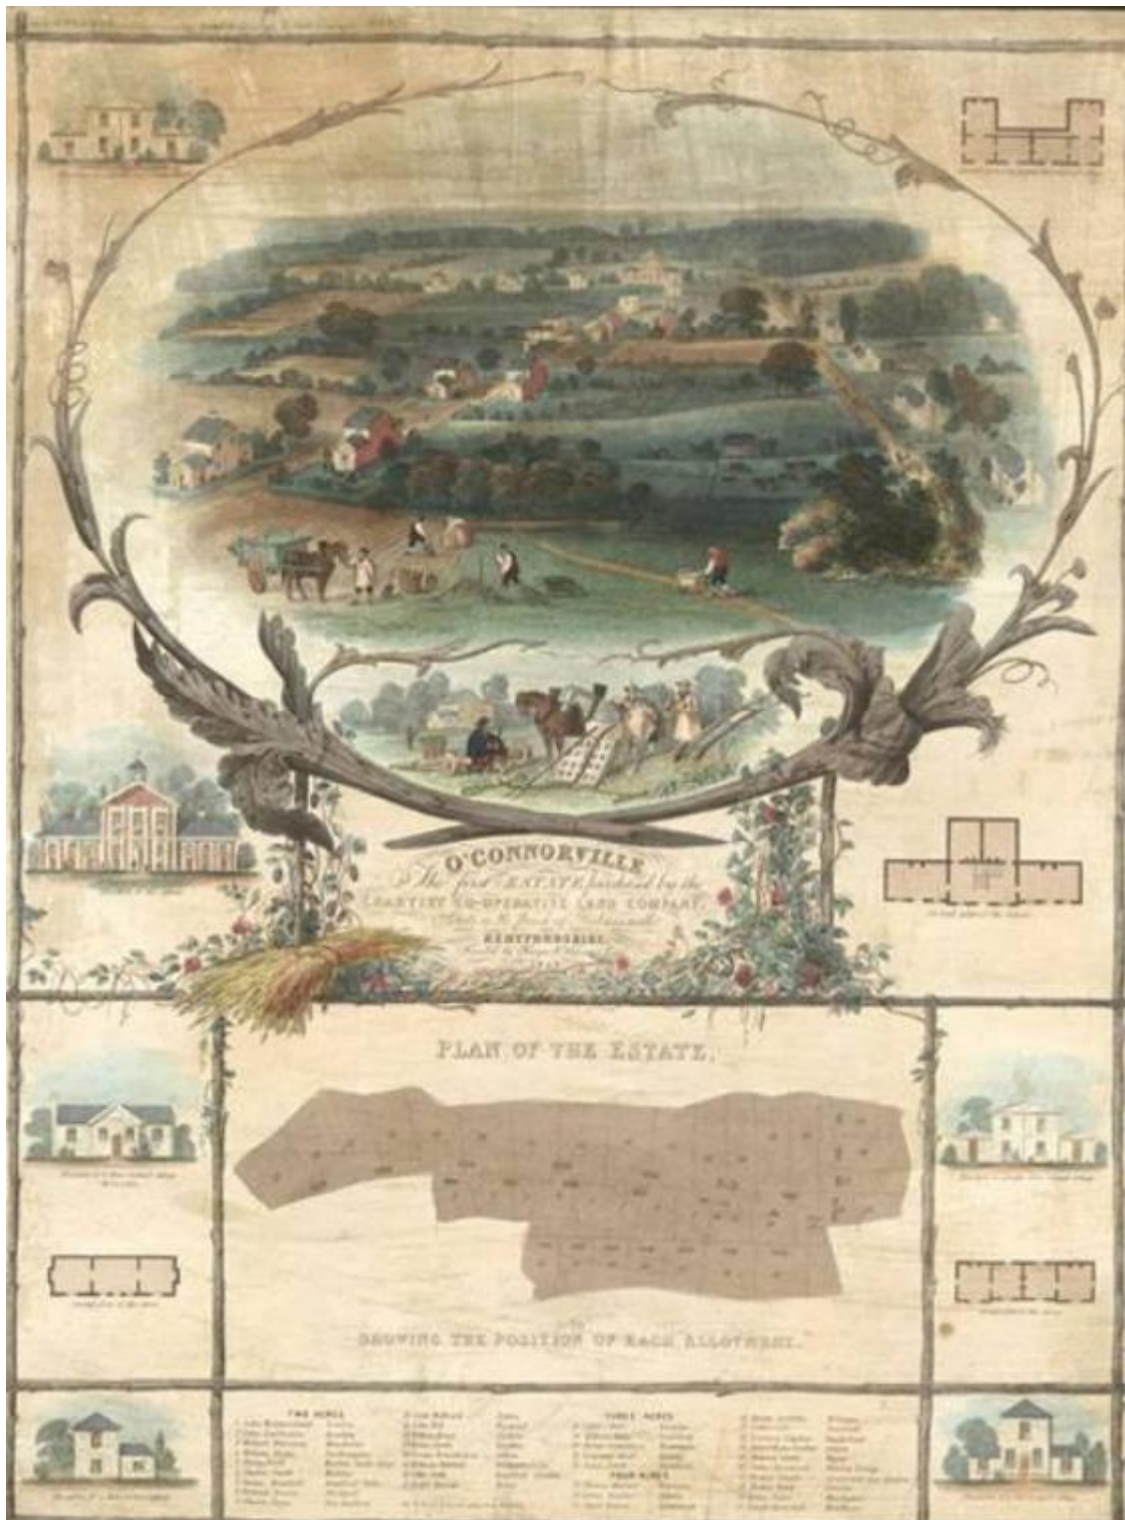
1848 estate plan of Herongate. Approximate position of Myrtle House, formerly Myrtle Cottage, circled on landscape view and as plot 10 on the plan. The building was originally a single storey cottage
